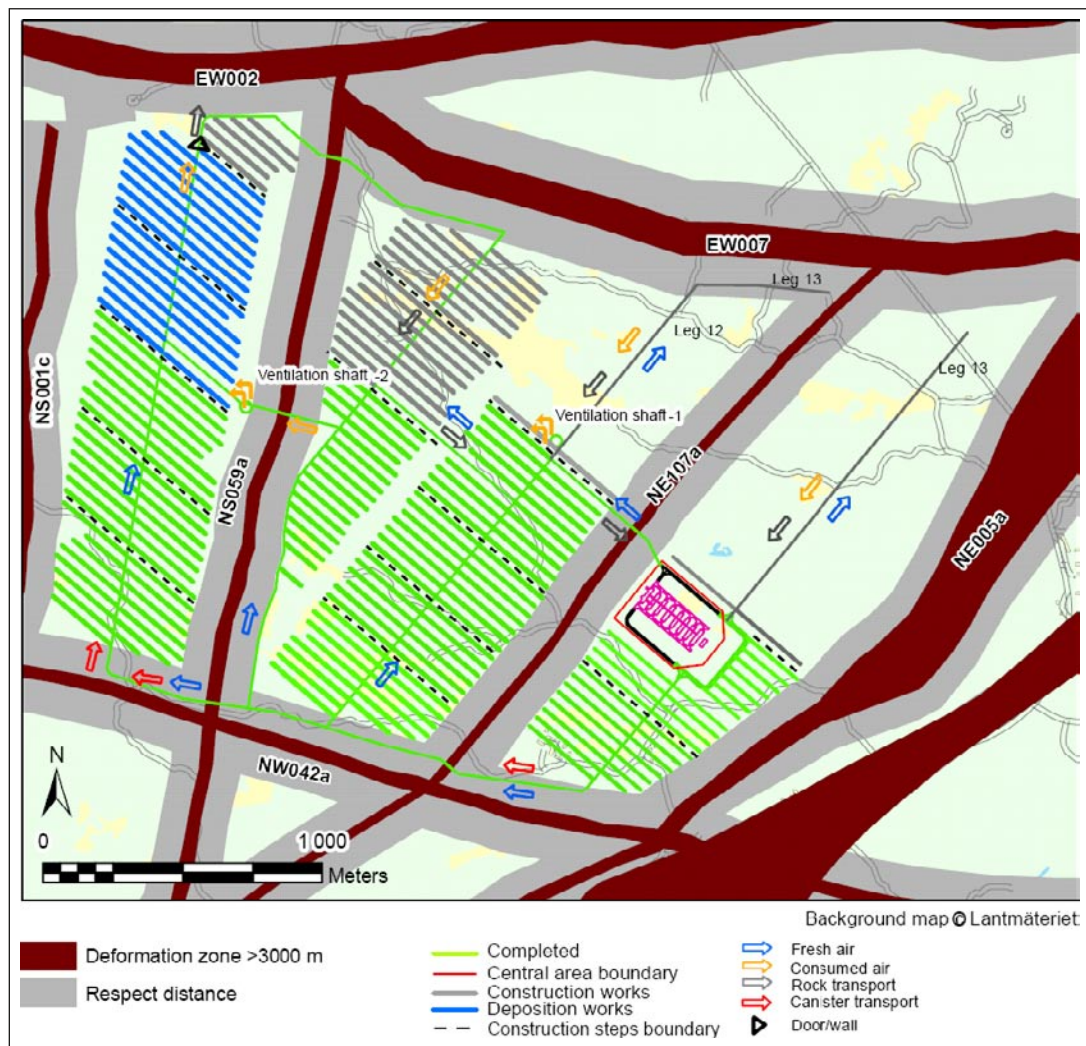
Excavation in leg 12 and 13 and in construction step 14 and deposition works in construction step 12.
